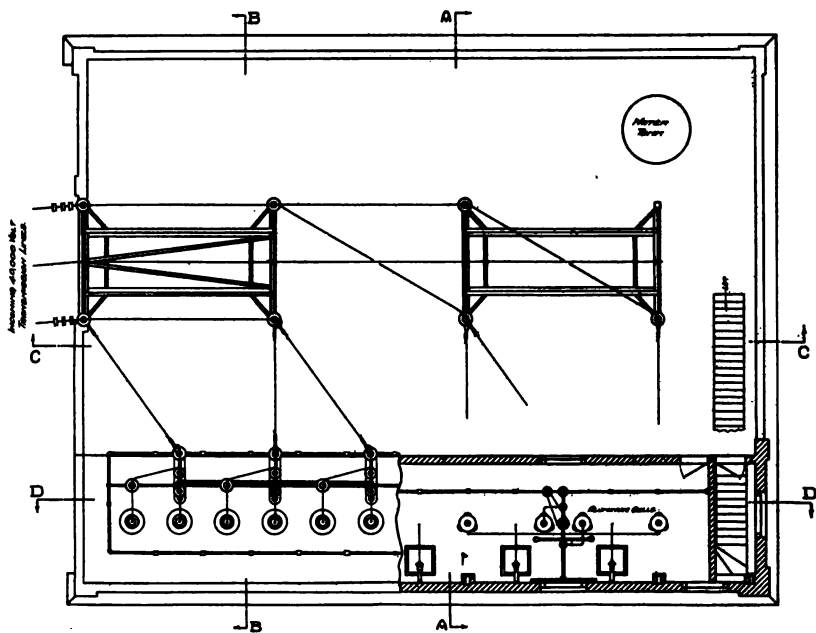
Roof Plan, Substation, Chattanooga & Tennessee River Power Co.
